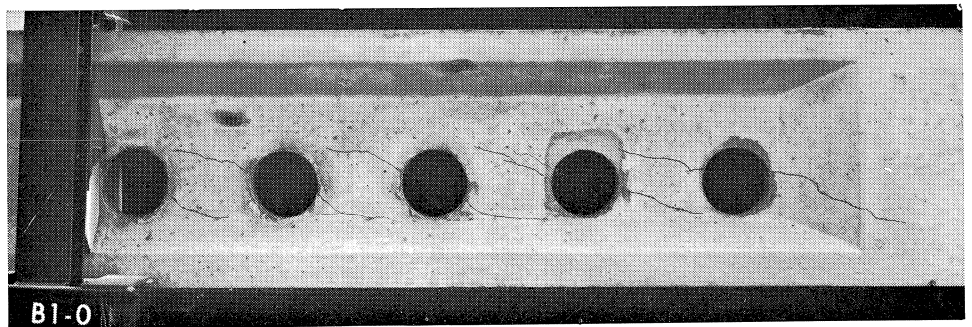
End region of a prestressed beam (see Fig. 66) provided with five holes, here shown after being loaded to failure.
